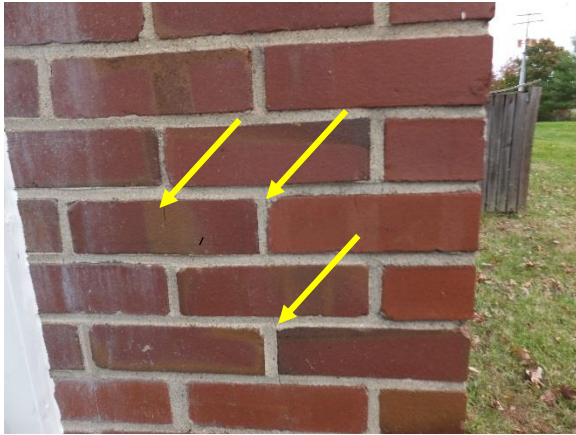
Typical crack in brick and mortar at chimney on southeast facade.
